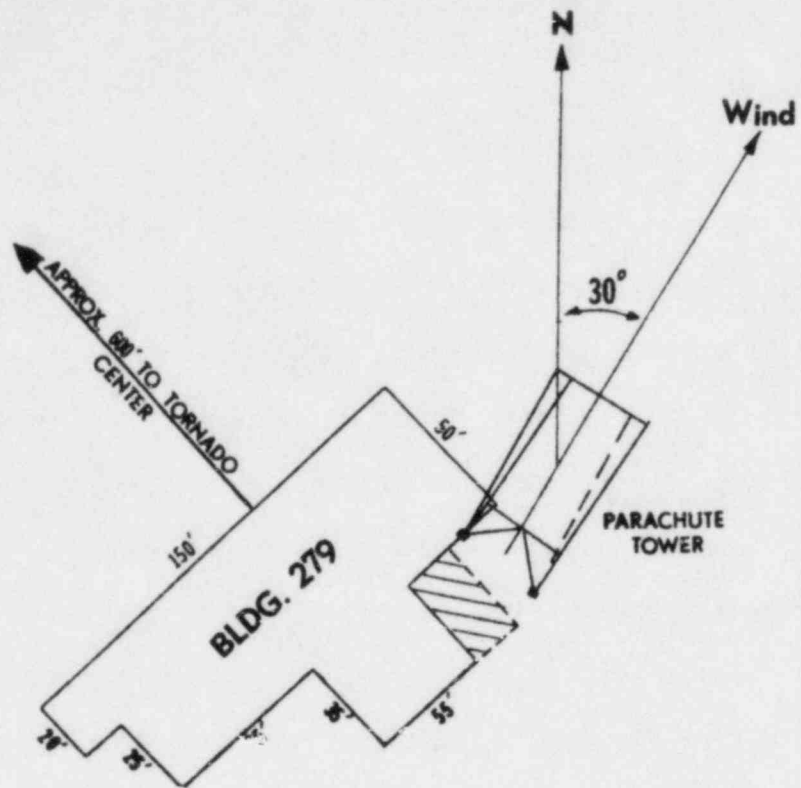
PLAN VIEW OF THE PARACHUTE TOWER AT BUILDING 279.
